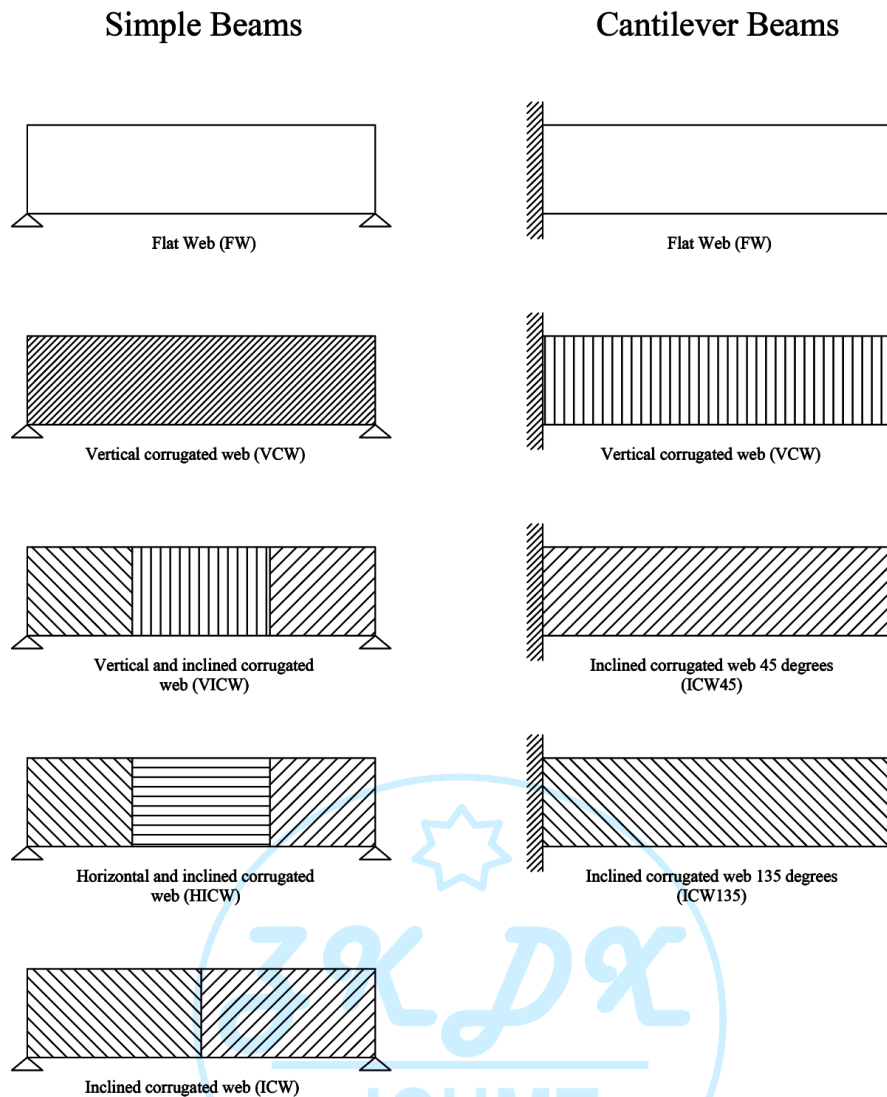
profiles of studied models of the simple beams and cantilever beam
